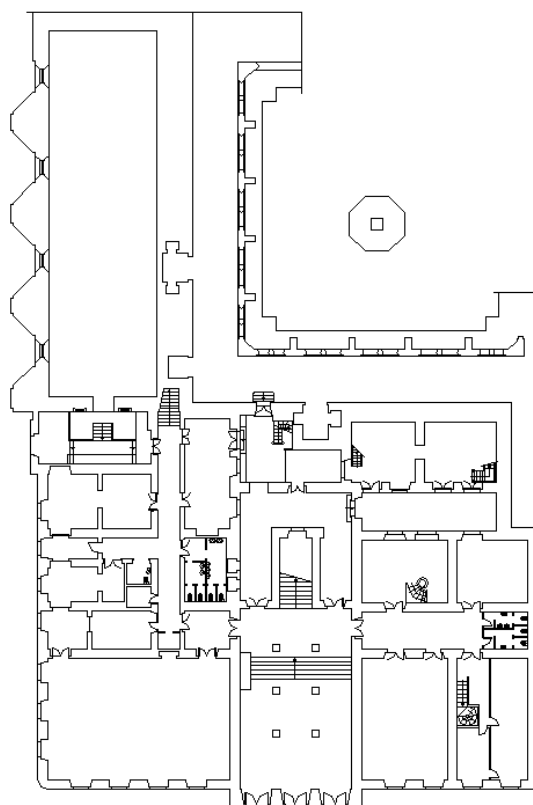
PLAN VIEW OF THE TOWN HALL
